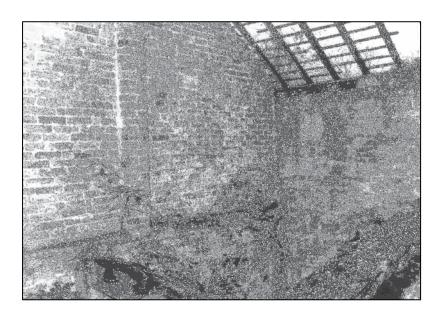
Building C, N 1F room, looking SW (photo 4/8).
